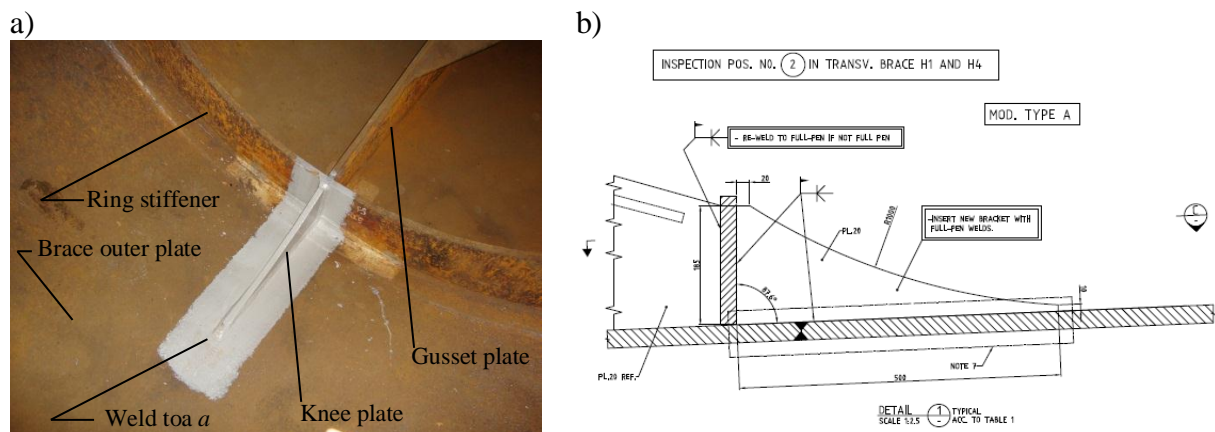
a) picture of the knee plate located inside brace H1 and b) drawing of the knee plate with dimensions as used in analysis.
